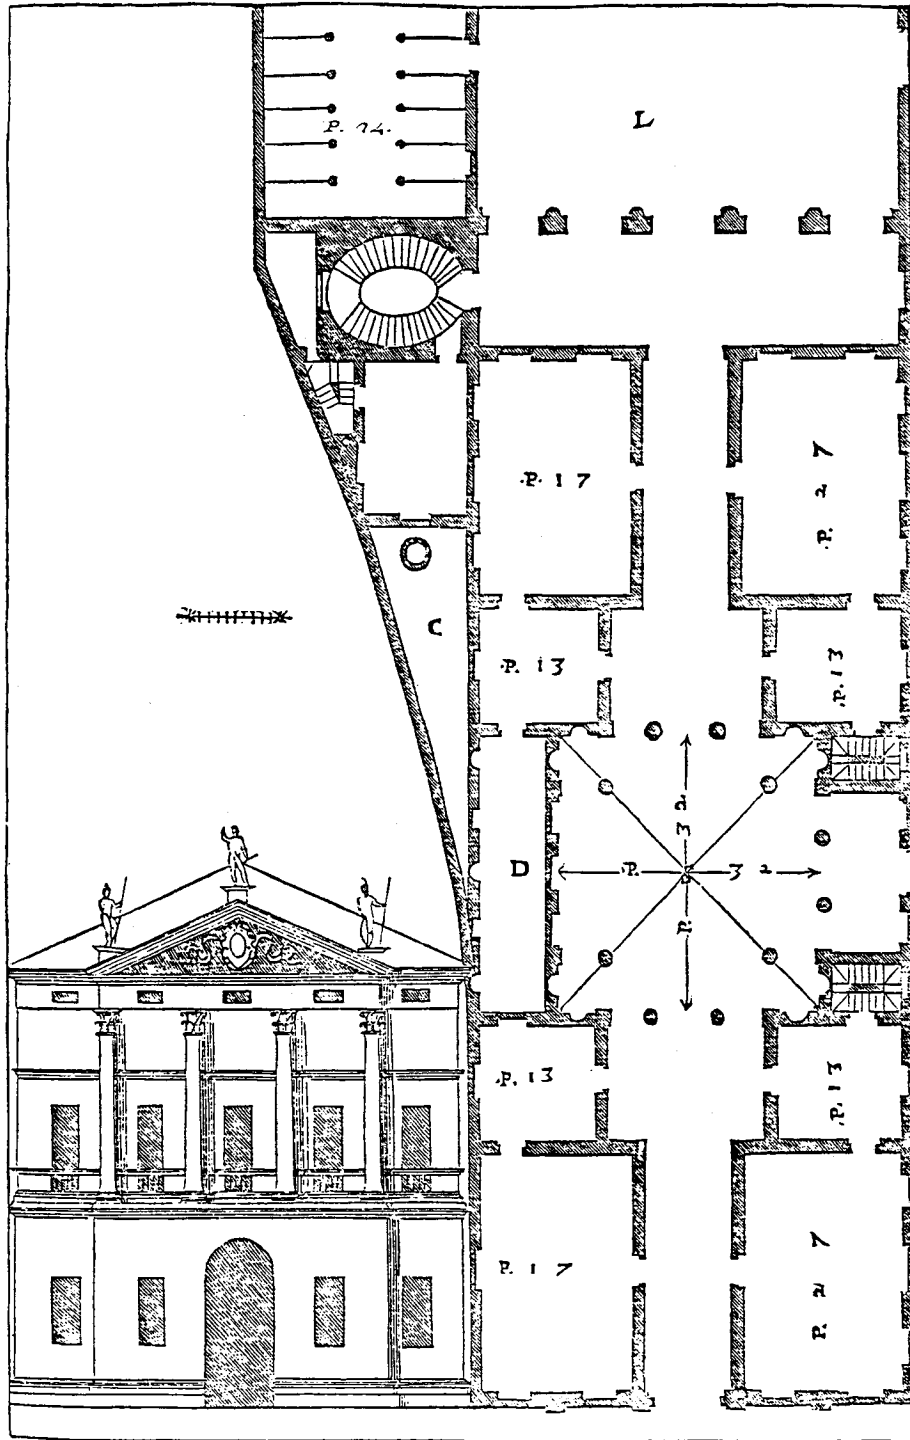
Andrea Palladio: plan and facade of Palazzo Capra (from "Quattro Libri")
